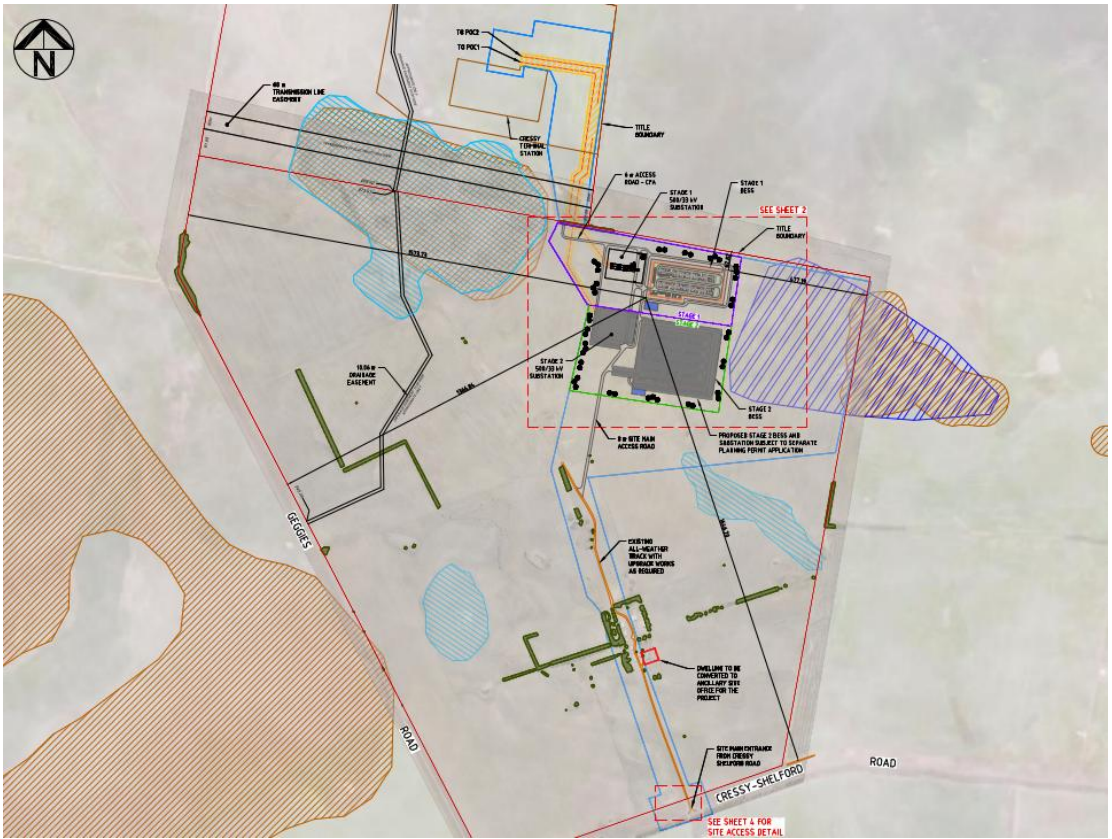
Proposed site plan – Stages 1 and 2. Source: Stage 1 Development plans.
